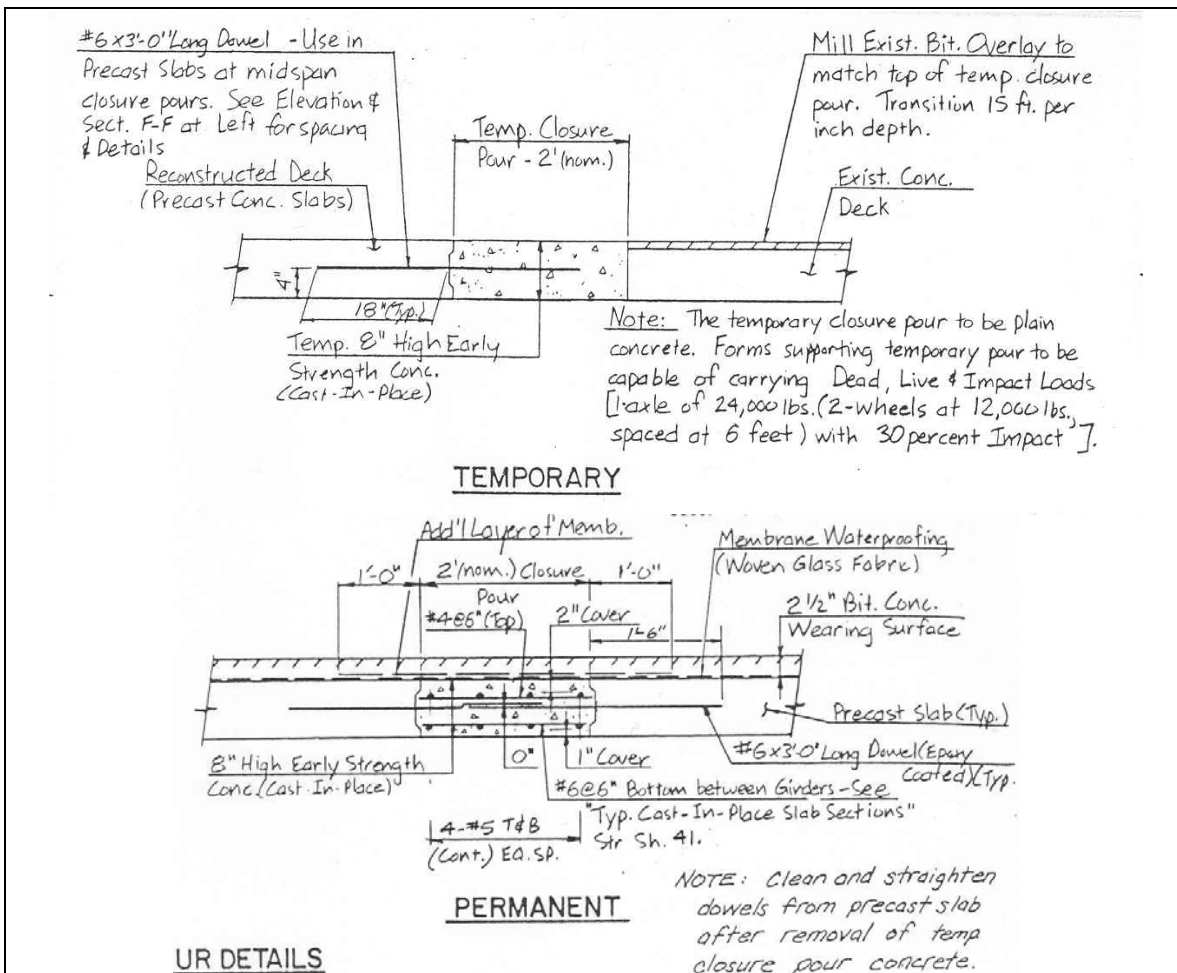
Detail for longitudinal segmental construction for a bridge in Seymour, CT (CT-DOT, 1992)
